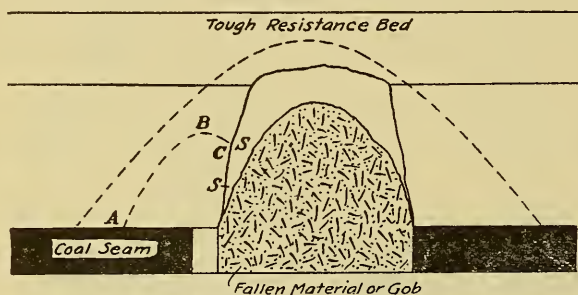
SPACE SHORTENED BY FALLING OF ROOF.
